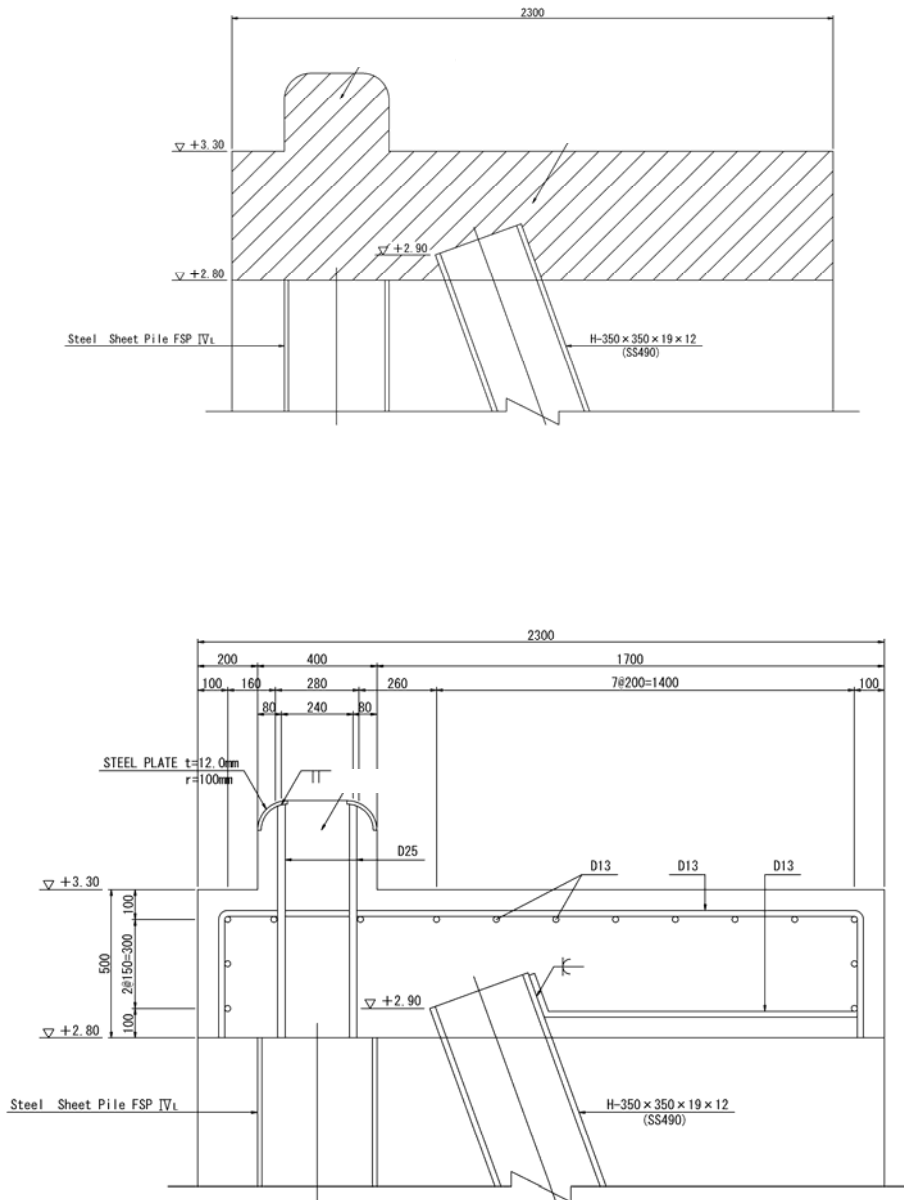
Detail of Coping Concrete of Extended B Dock
